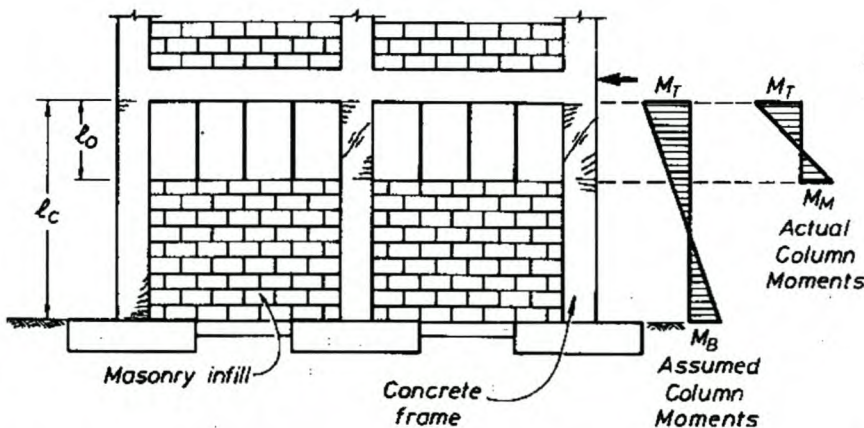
Partial masonry infill in concrete frame (Paulay and Priestley, 1992)
